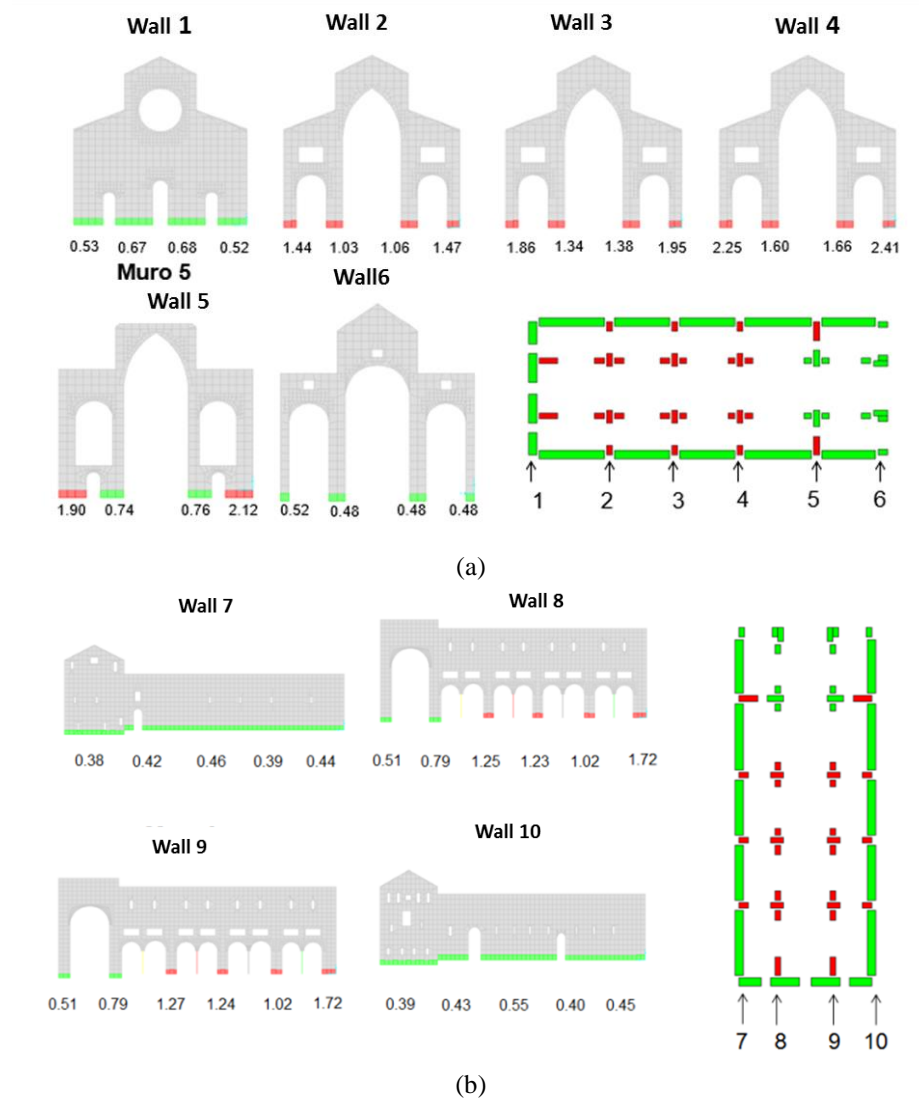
Sliding check for all the walls of the cathedral: (a) transversal walls and (b) longitudinal walls
